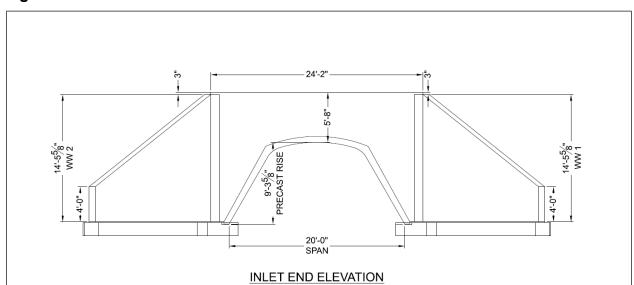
Bottomless Culvert Inlet—Elevation and Dimensions
